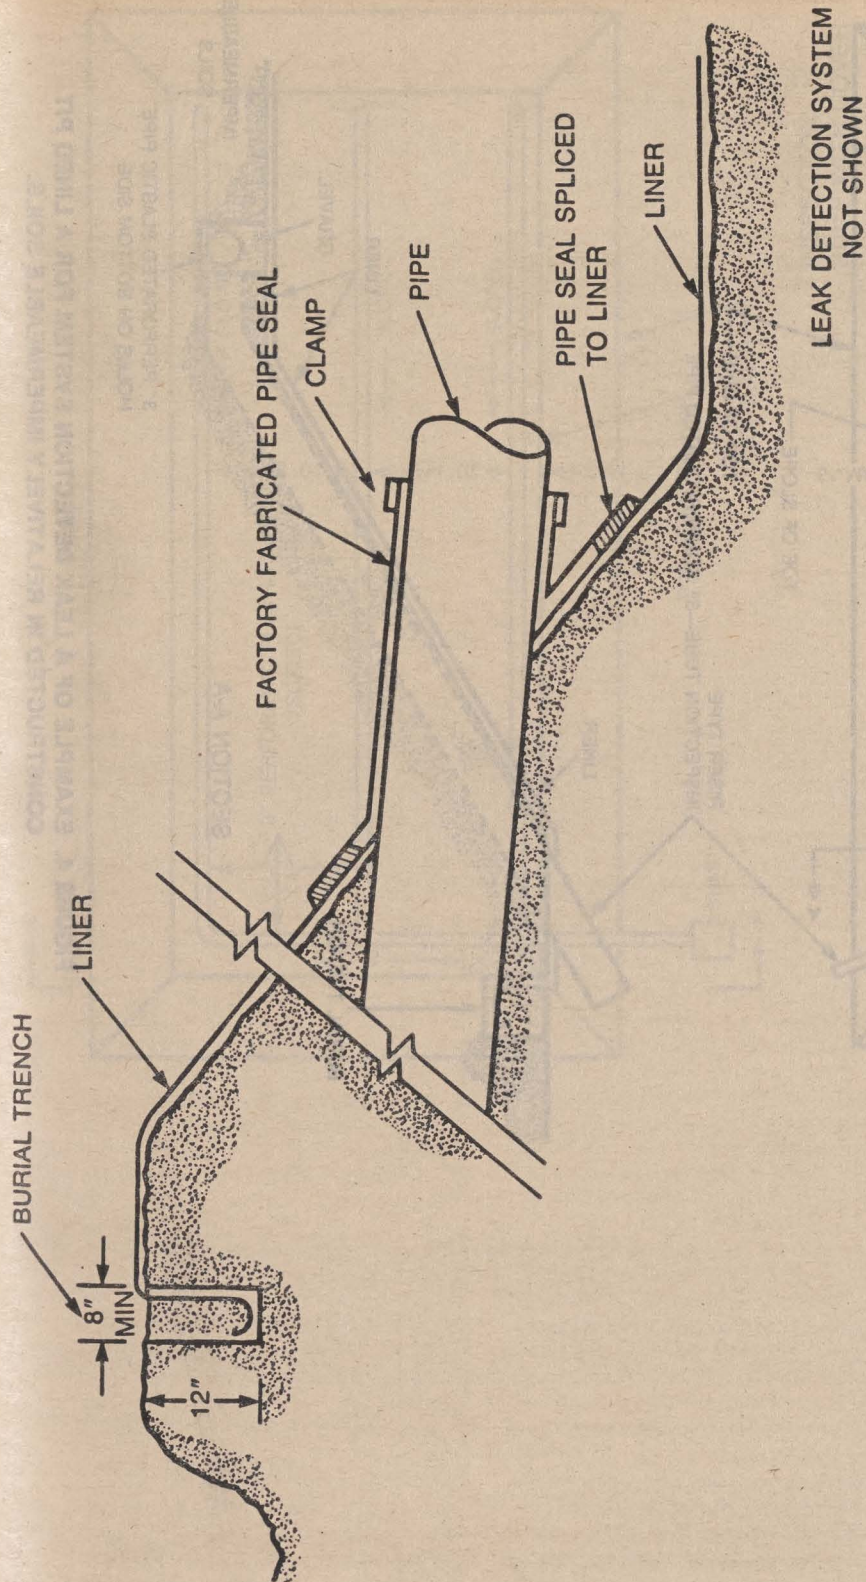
EXAMPLE OF MINIMUM ACCEPTABLE STANDARDS FOR INSTALLATION OF A FLEXIBLE LINER.
